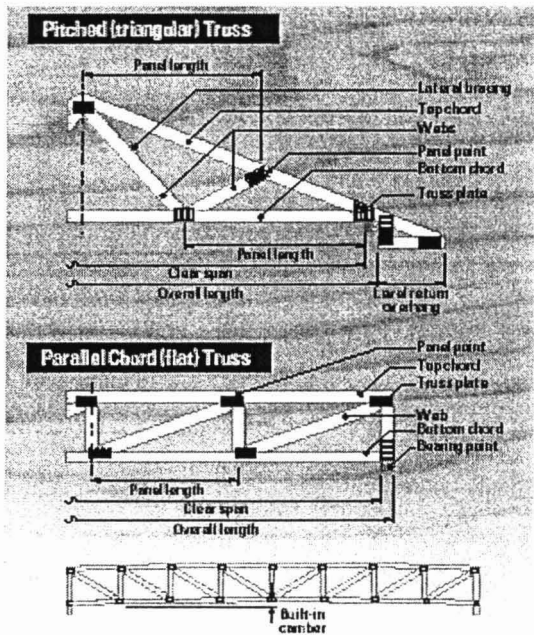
Some Basic Terminology used for Roof Trusses (source: [www.truss-frame.com](http://www.truss-frame.com) 2007)
